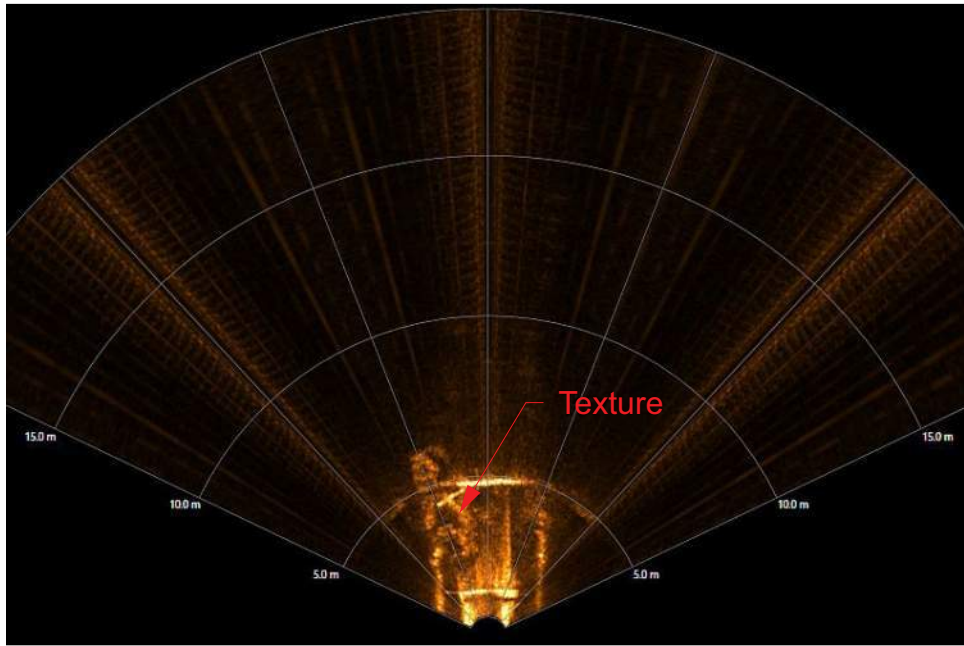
B-3: Sonar image at 170 feet downstream of Manhole 3. Texture on invert at outlet 16 feet ahead.
